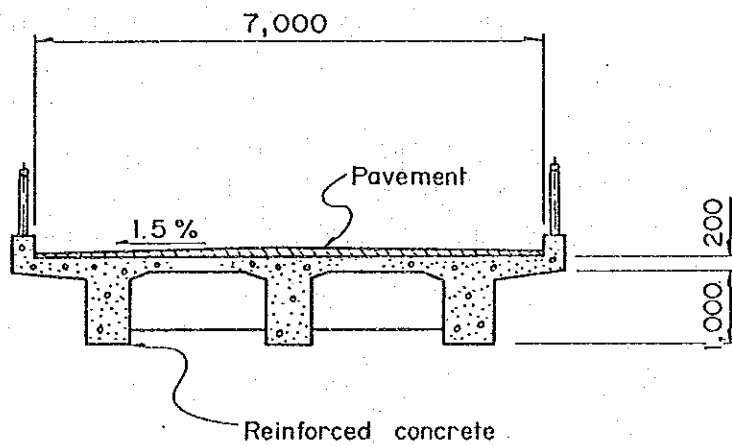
Structural Plan on Profile of Qda Lucuma (S5)
